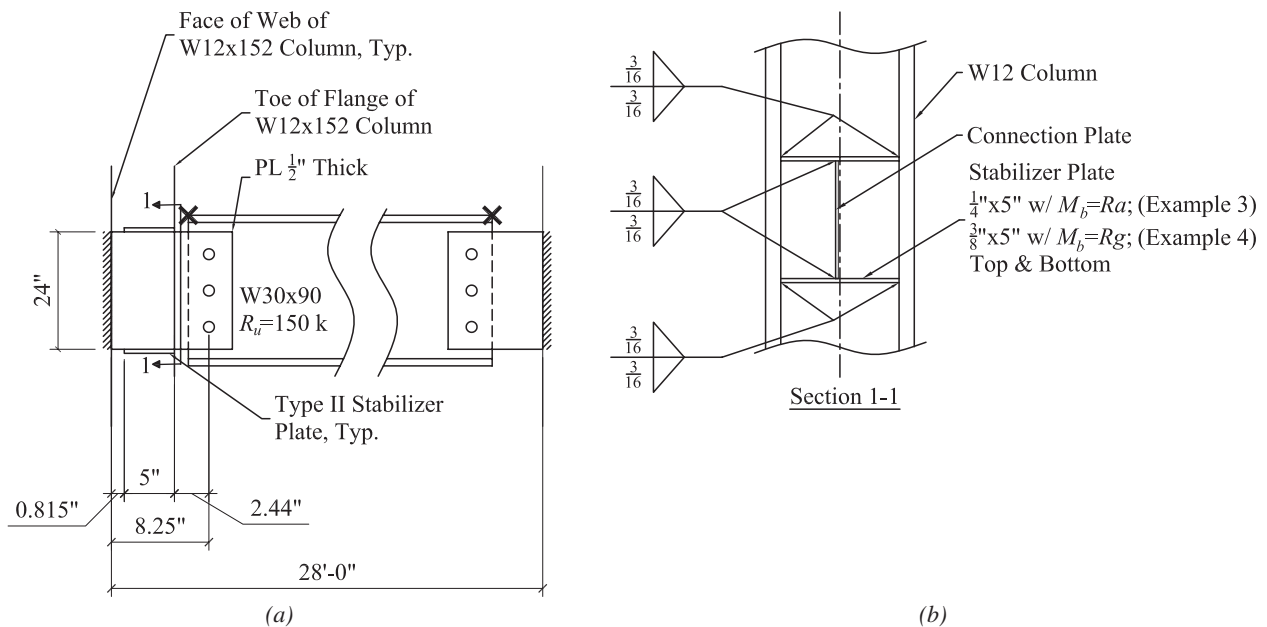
Single-plate shear connection—examples 3 and 4: (a) elevation; (b) final stabilizer plate details.
